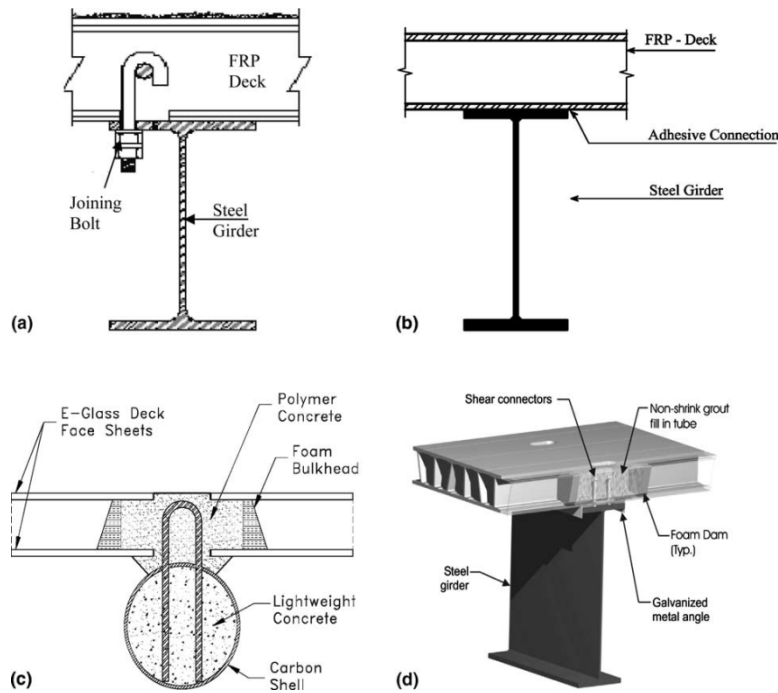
Various types of joining techniques of deck-girder connections (a) bolted connection (b) adhesive bonding (c) hybrid connection (d) shear stud connection (Zhou & Keller, 2005)
